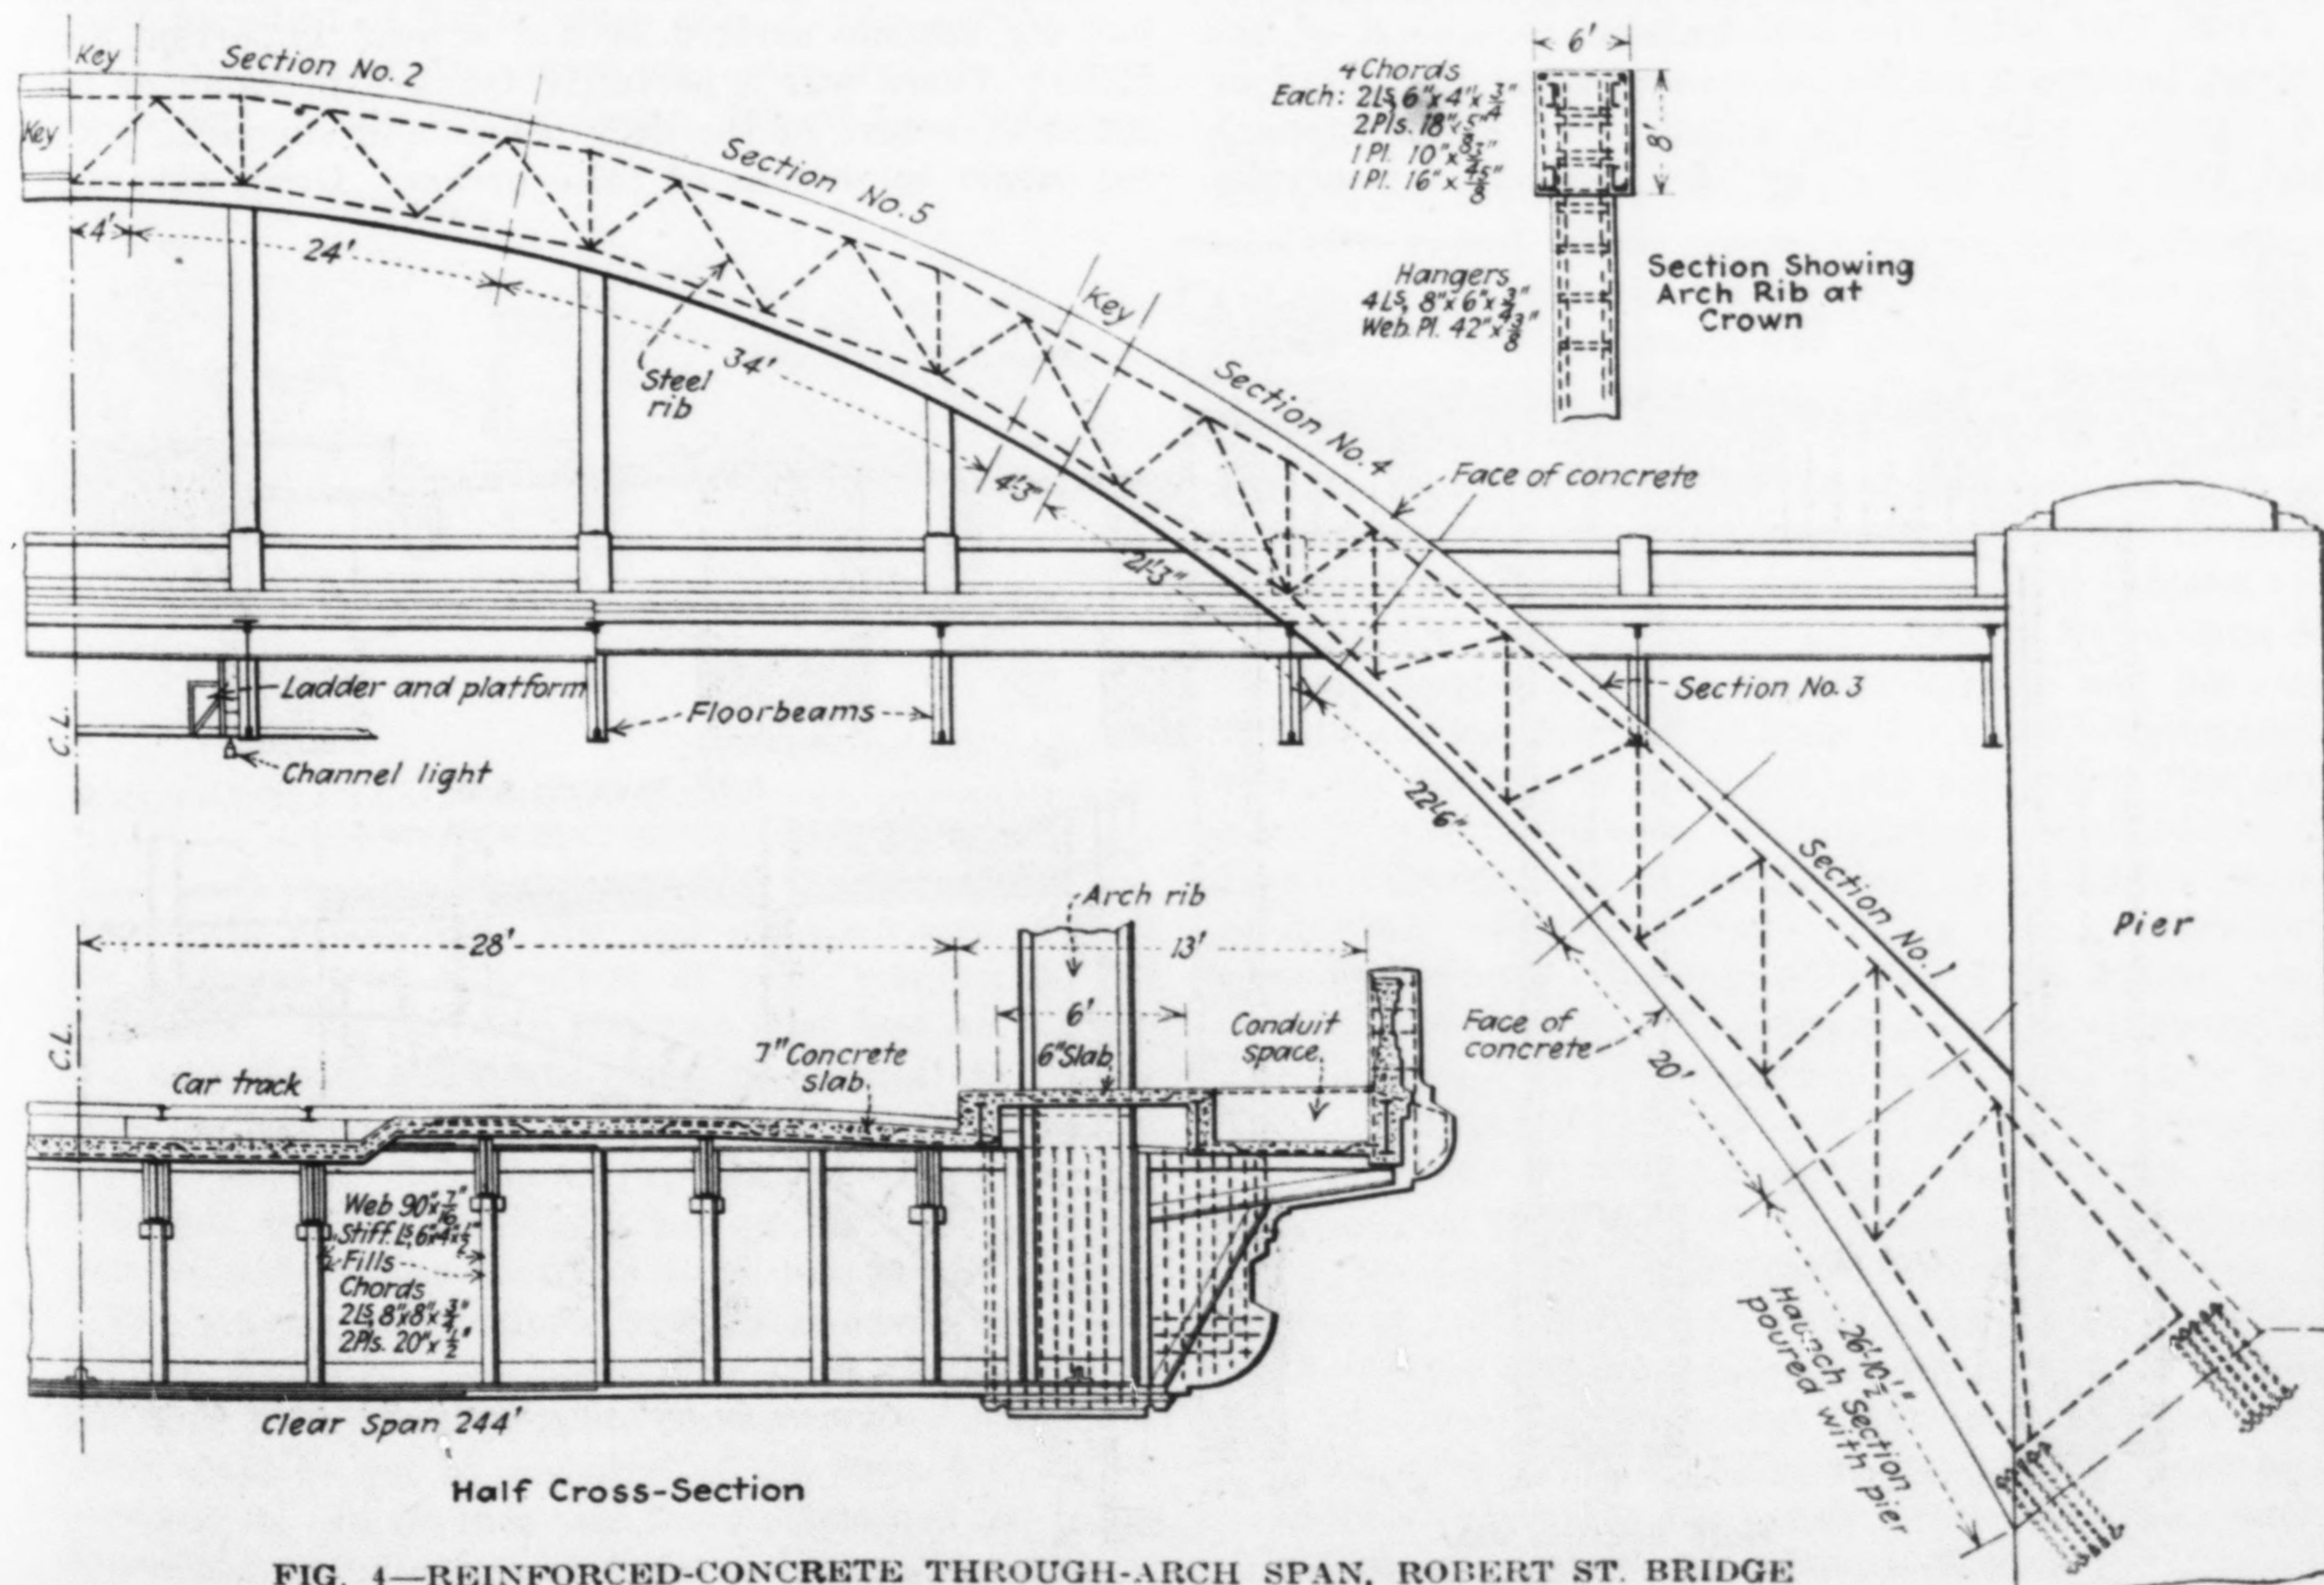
REINFORCED-CONCRETE THROUGH-ARCH SPAN, ROBERT ST. BRIDGE
